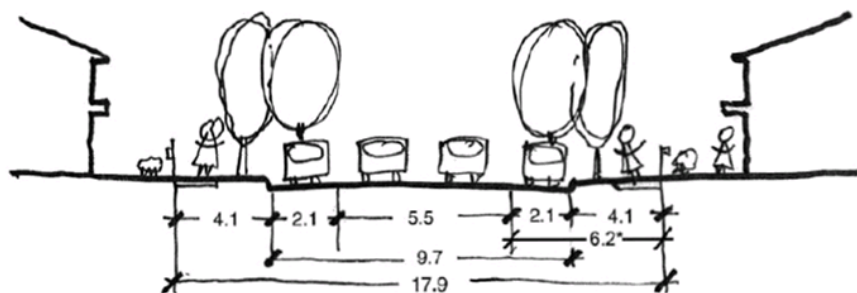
Access Street B – Typical Cross-section Source: WAPC Liveable Neighbourhoods.
